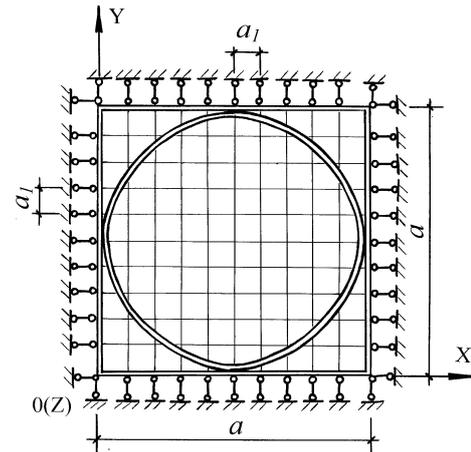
Design scheme of pneumatic cladding element: a – dimension of pneumatic cladding element, a_1 – distance between the conditional yarns in warp and weft directions
